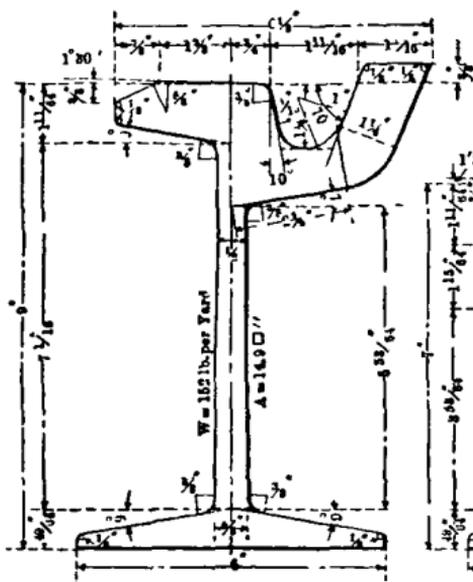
Am. El. Ry. Eng. Assn. 9-in girder guard rail. American Standard E7-1923.
